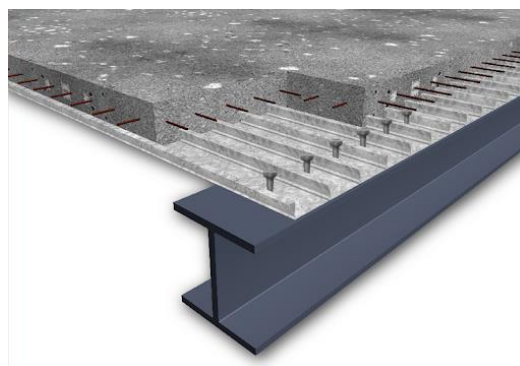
Example of the device of the floor of composite steel and concrete structures
